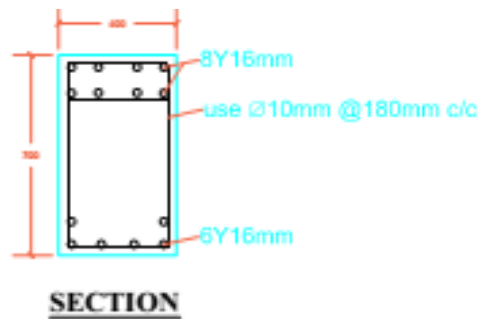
Rectangular water tank-columns & beams structure drawing
